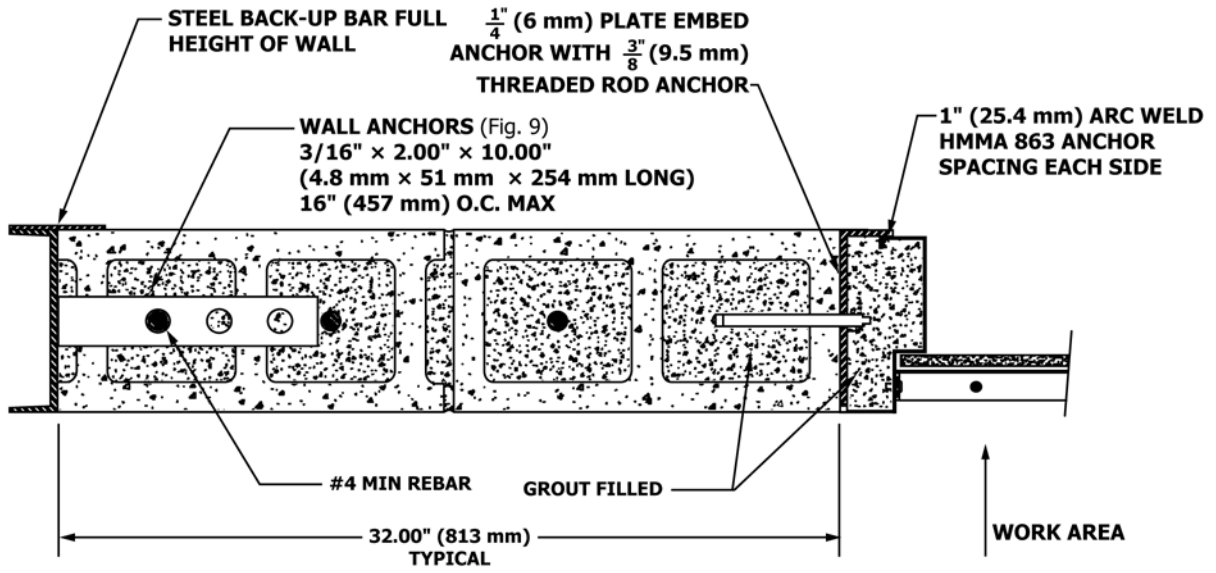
Section A-A Embed Type in Masonry/Concrete Anchors
